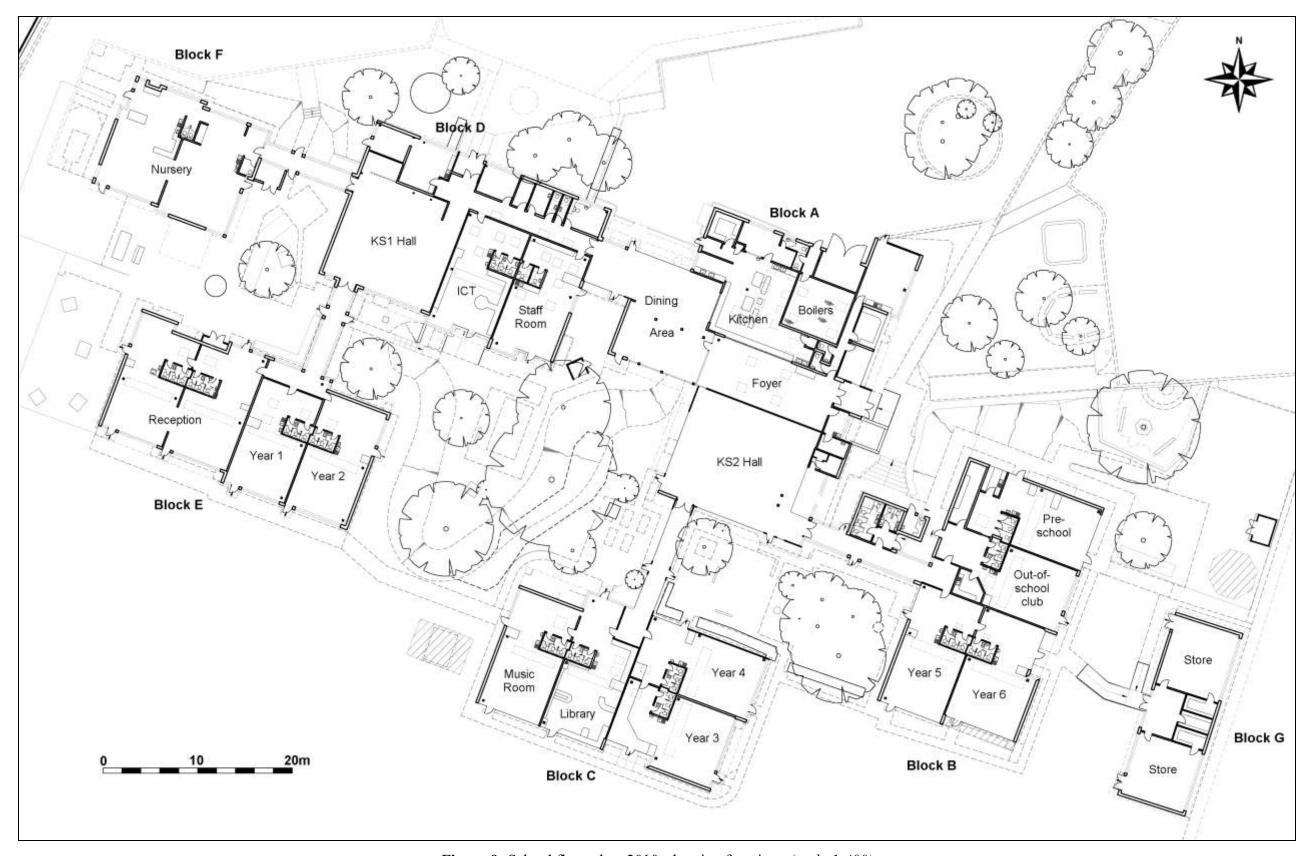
School floor plan, 2010, showing functions (scale 1:400)
